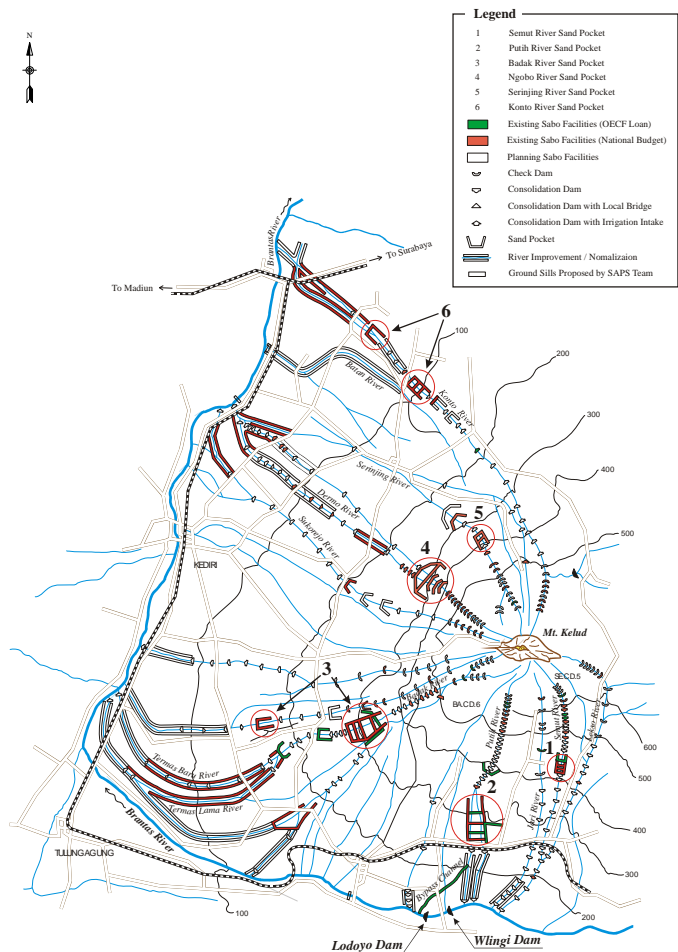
Sediment Control Plan in Mt. Kelud Area
